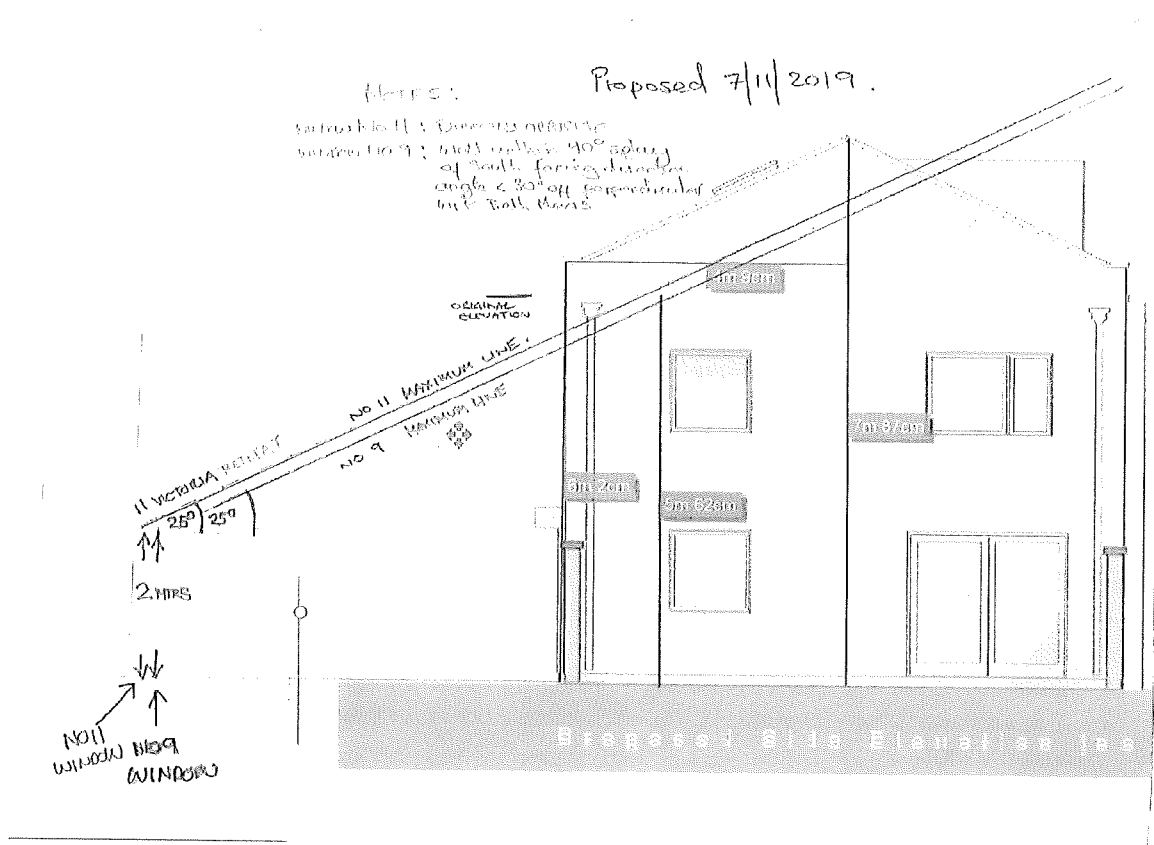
Fig A: New proposal further exceeds maximum obstruction angle for both 9 and 11 Victoria Retreat, to the nearest rear ground floor windows.
